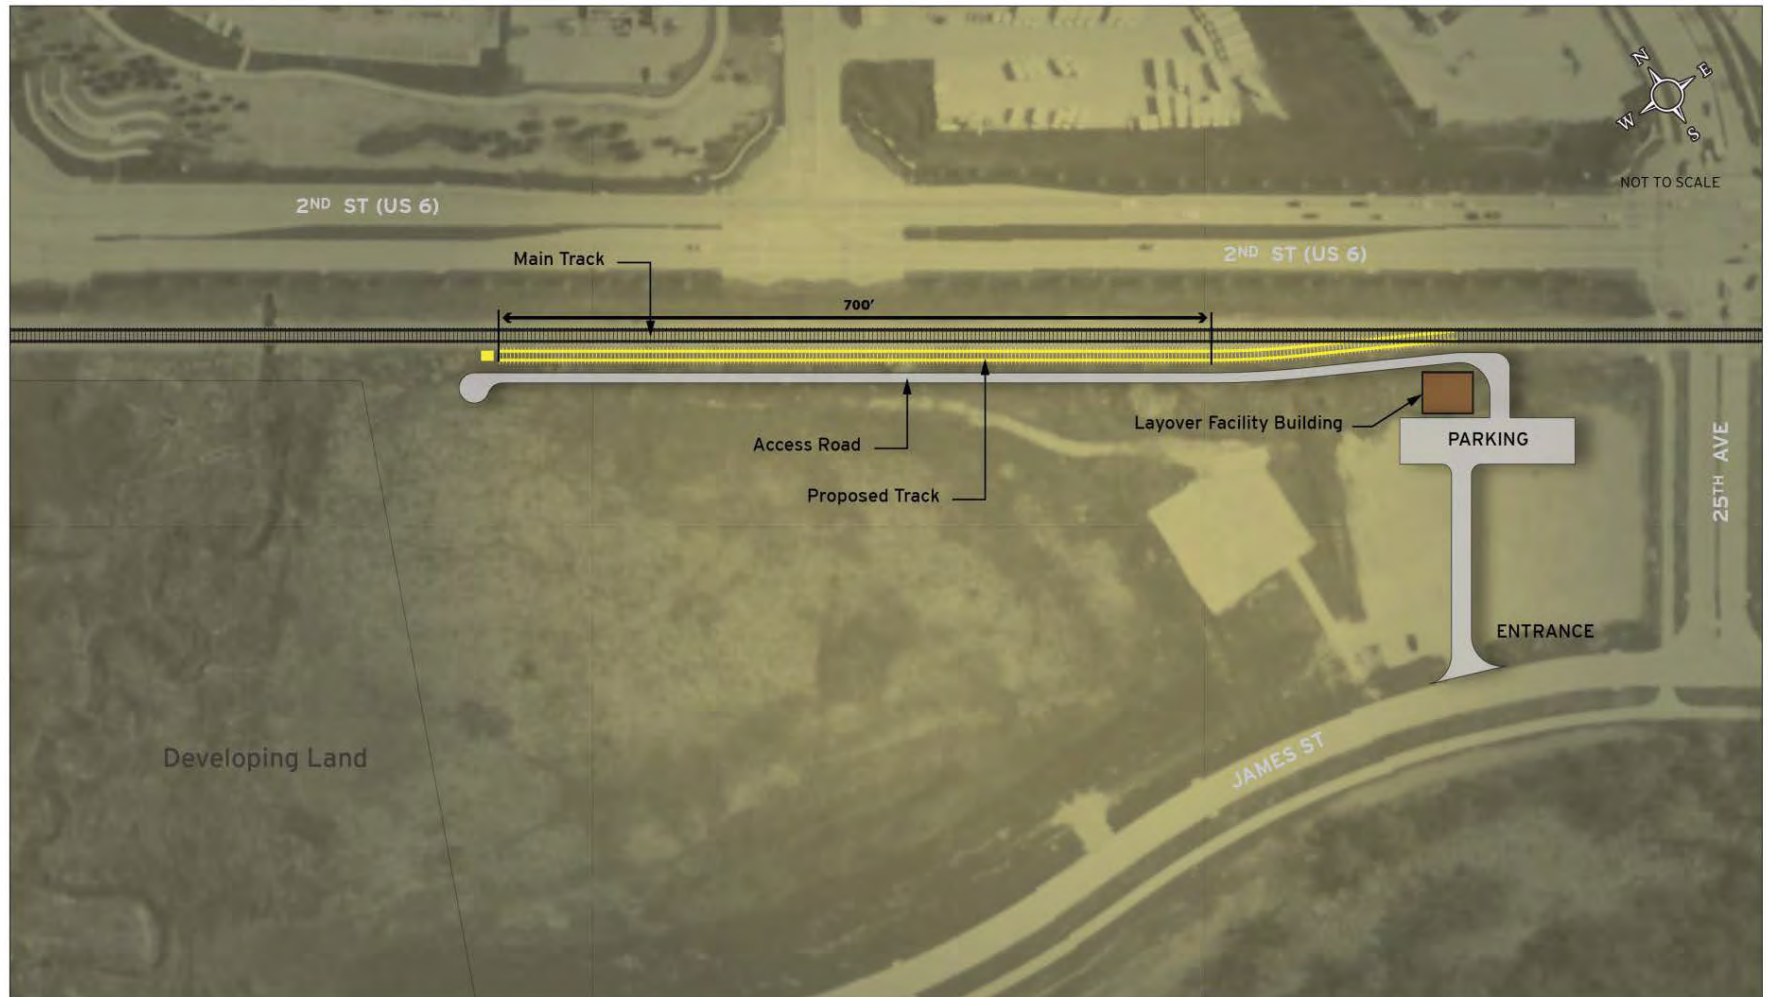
Coralville Conceptual Layover Facility Site Plan (Coralville, Iowa)
